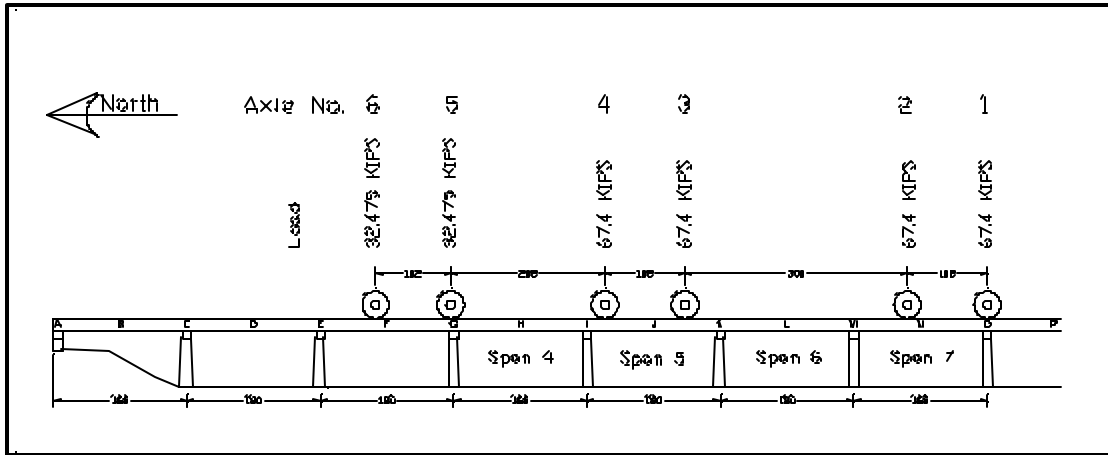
Loads applied to Bridge 32.35 due to load position 1@O. Dimensions are in inches.
